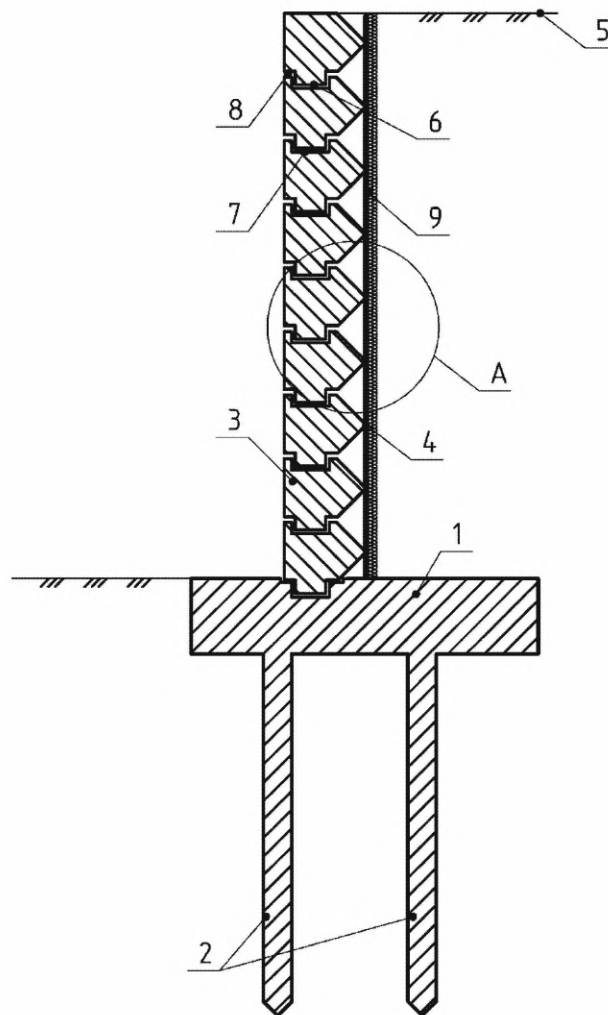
Prefabricated block type retaining wall: 1 – foundation slab; 2 – piles; 3 – blocks; 4 – surface in the form of pyramids; 5 – soil; 6 – spikes; 7 – groove; 8 – high-strength solution; 9 – two sheets of flexible, resilient material.
